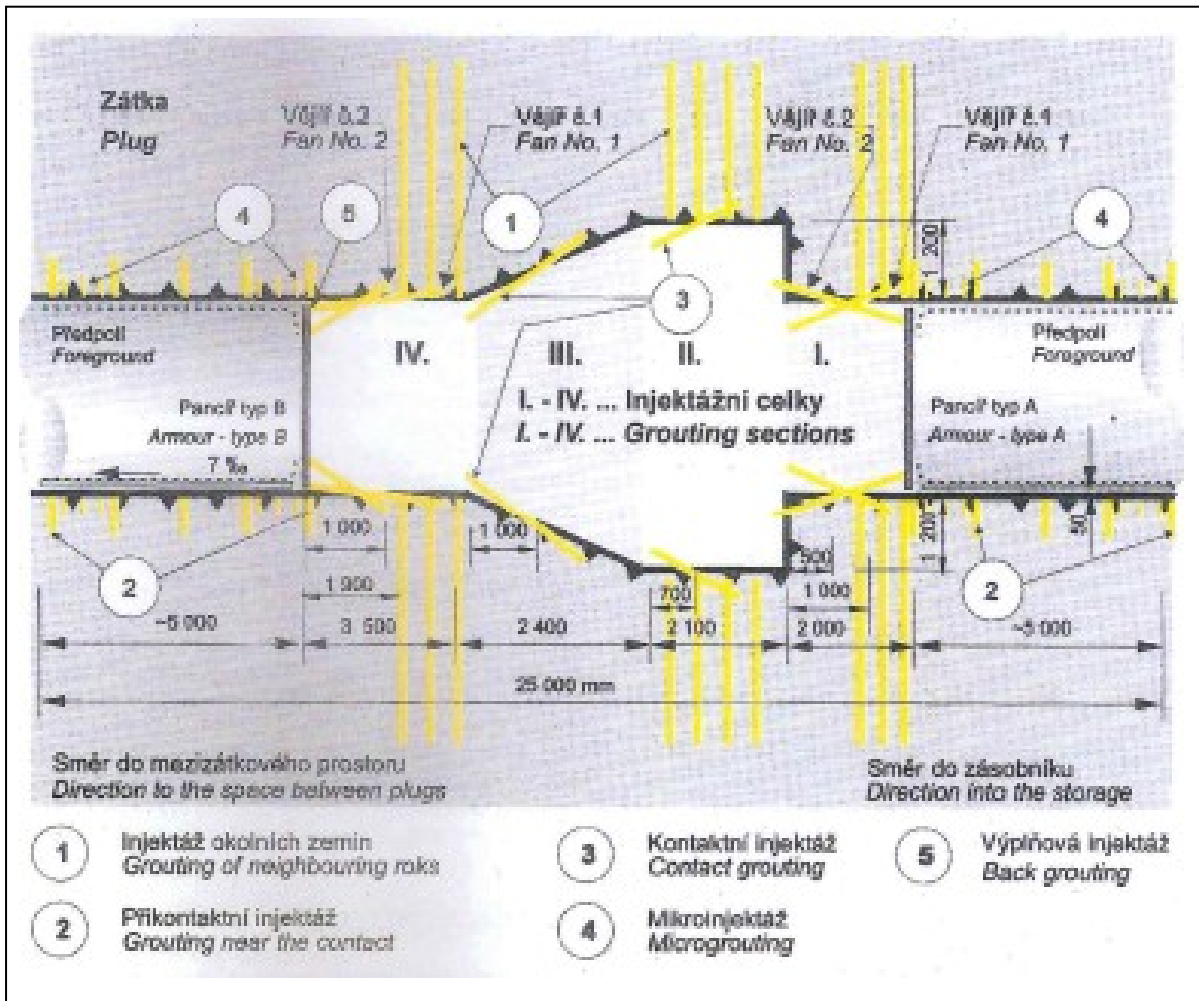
Grouting of the rock surrounding the concrete plugs used in the Háje underground gas storage facility (Cigler *et al.*, 1999).
